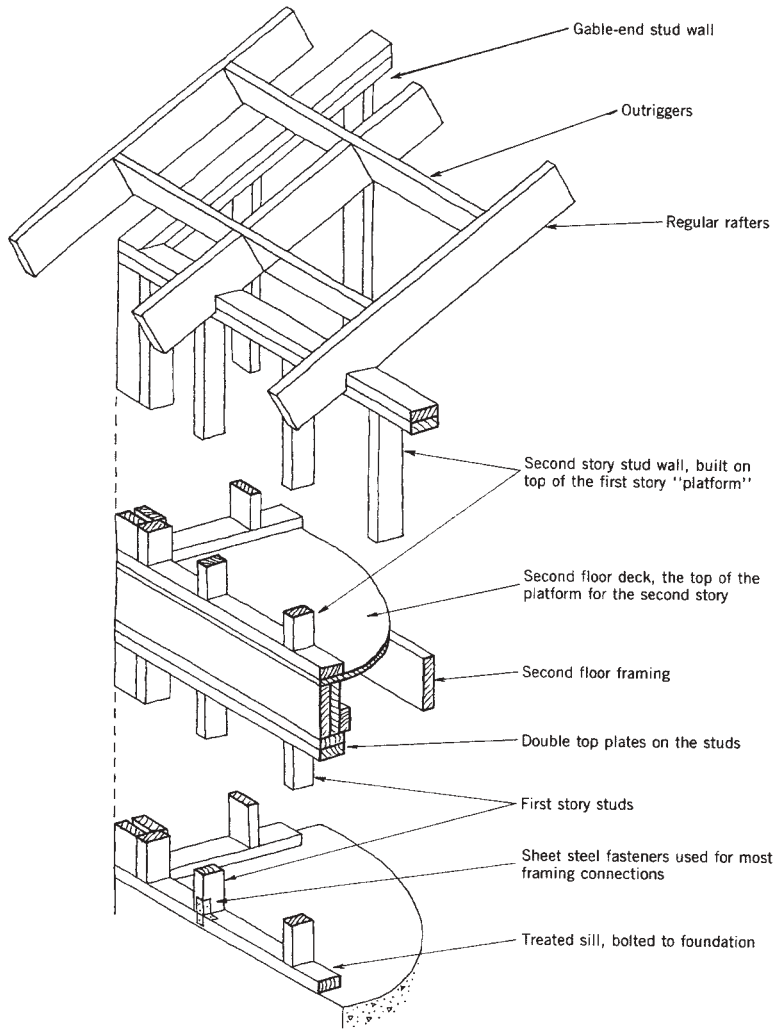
An All-American classic structure: the light wood frame, achieved almost entirely with "2 x" dimension lumber. Wall studs serve as columns to support horizontal members in the time-honored post and beam system with its roots in antiquity. While systems of much greater sophistication have been developed, this is still the single most widely used structure in the United States today.
